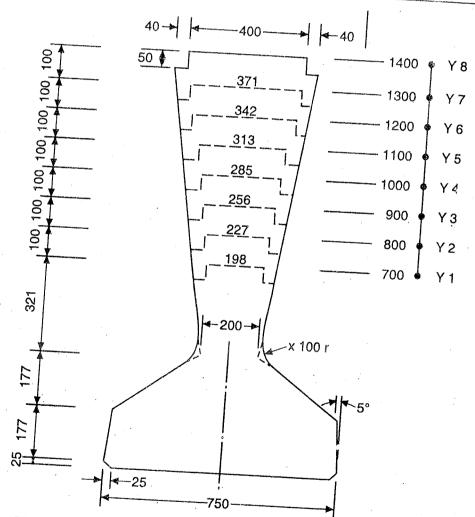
Cross Section of Standard Y-Beams (U.K.).
